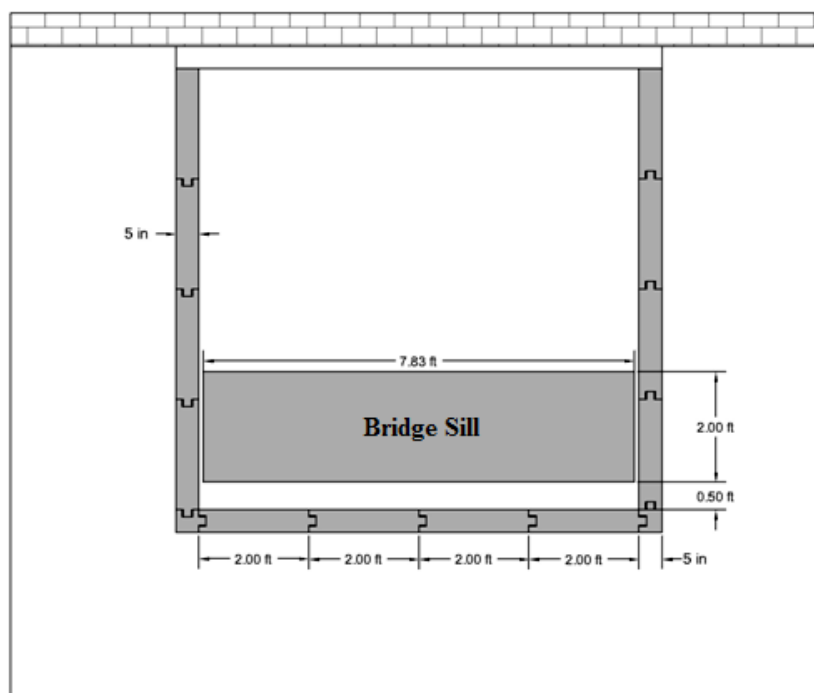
Plan view of CLSM bridge abutment and location of the bridge sill.
